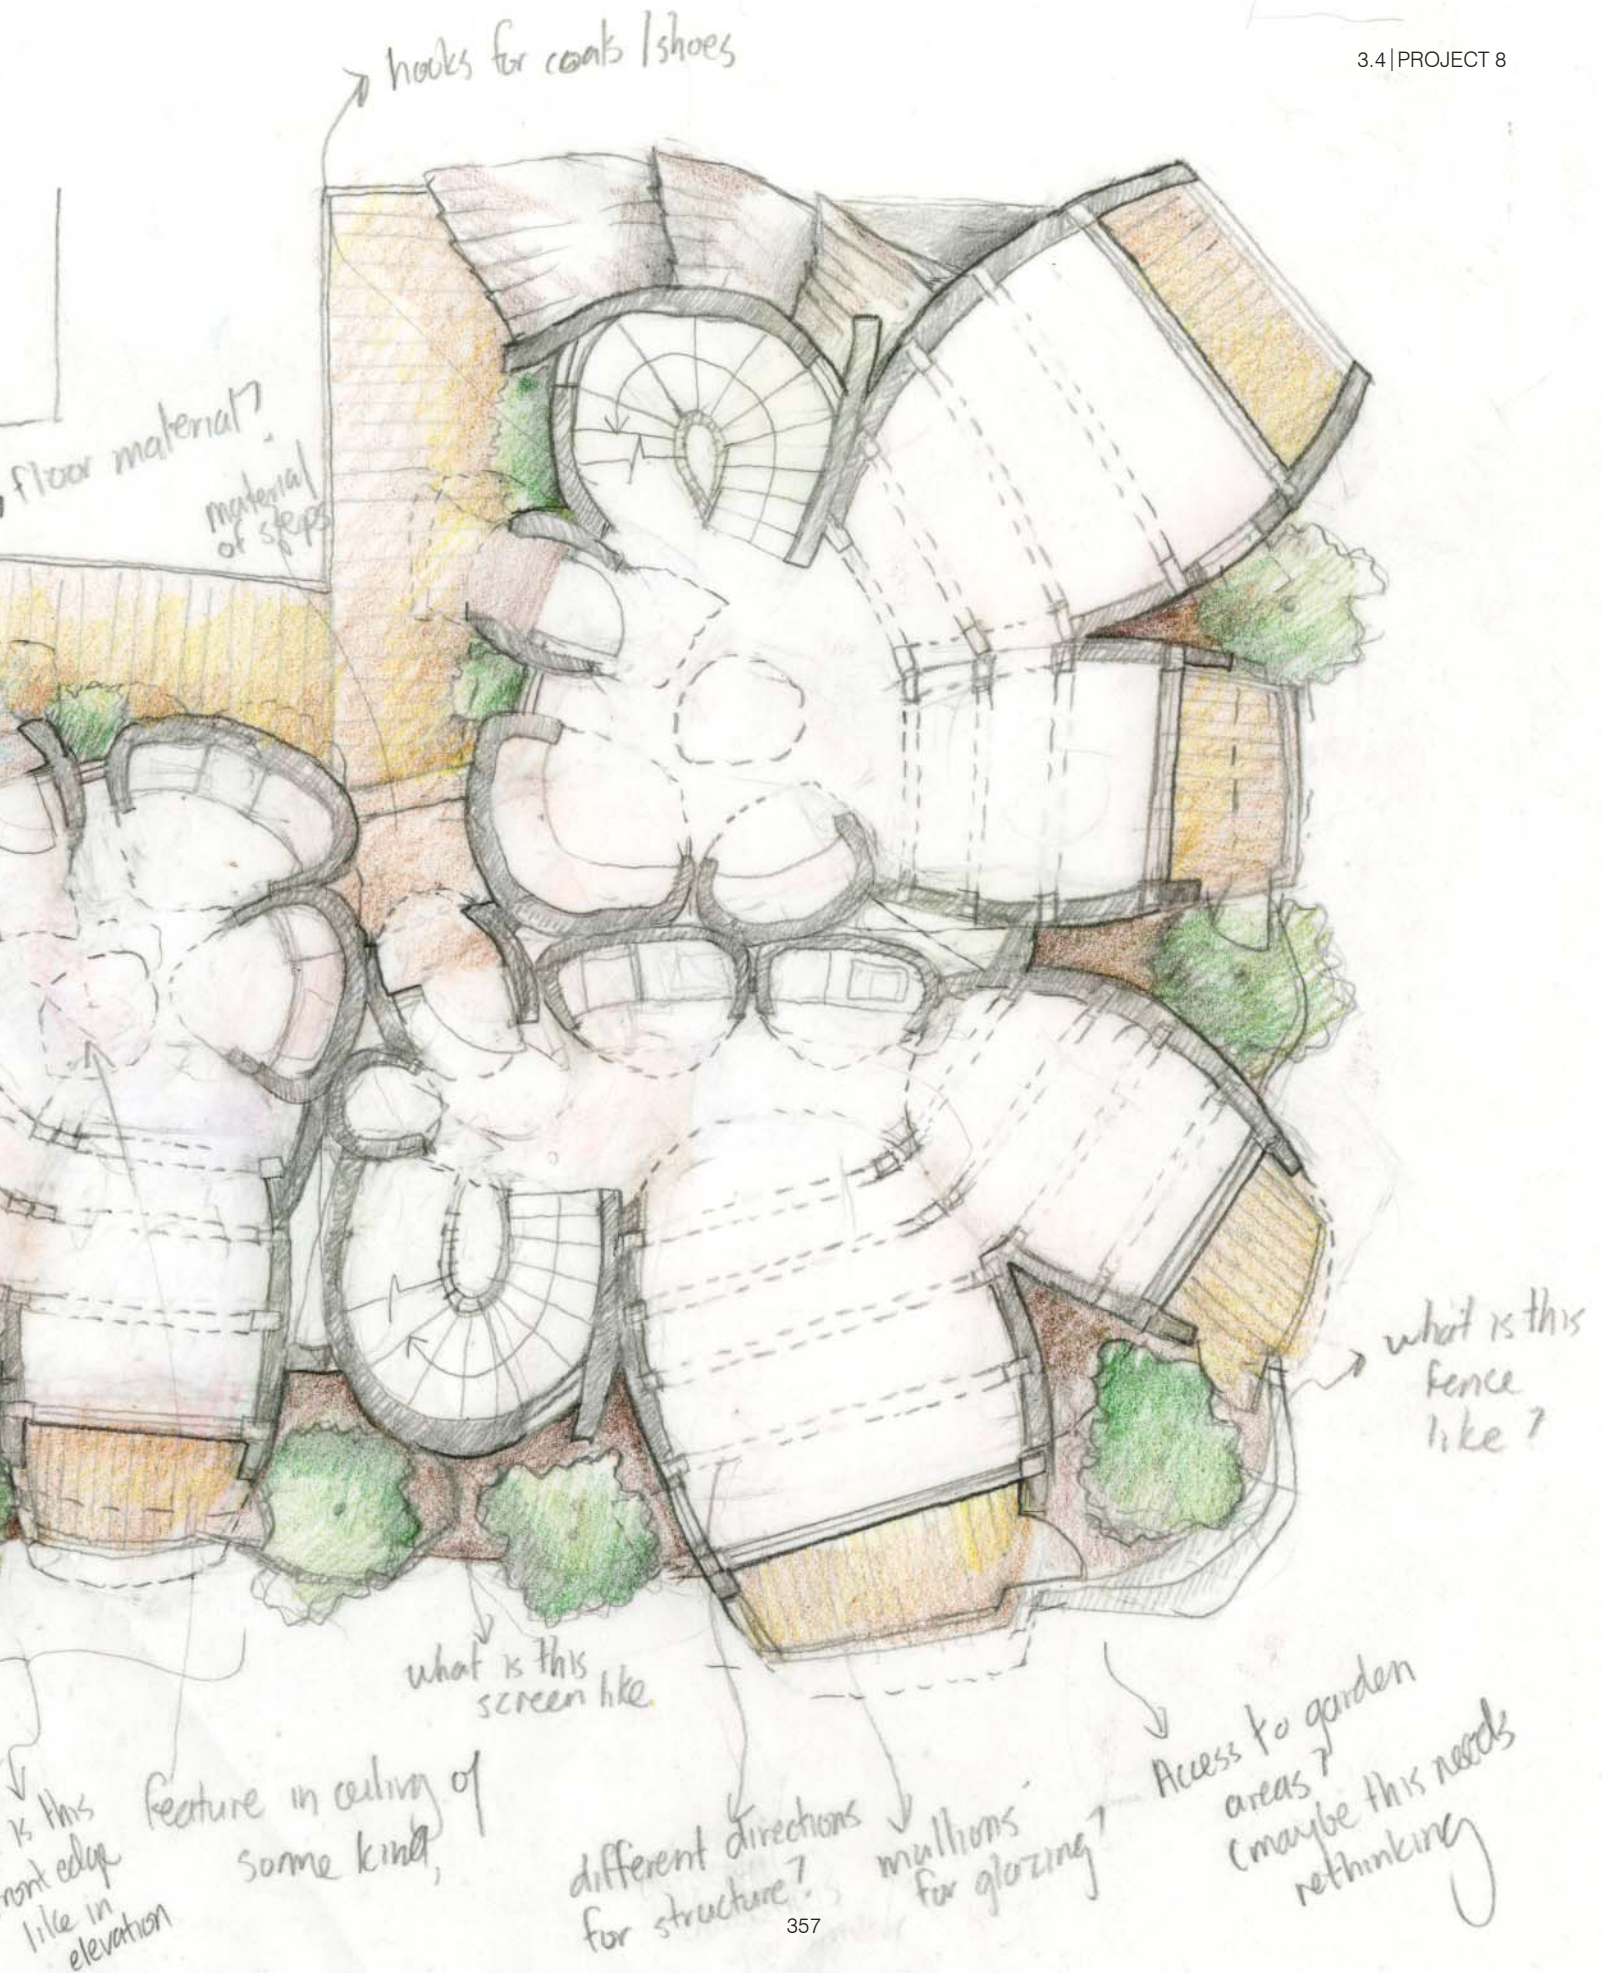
Developed sketch of first floor plan at approximately 1:75 scale
